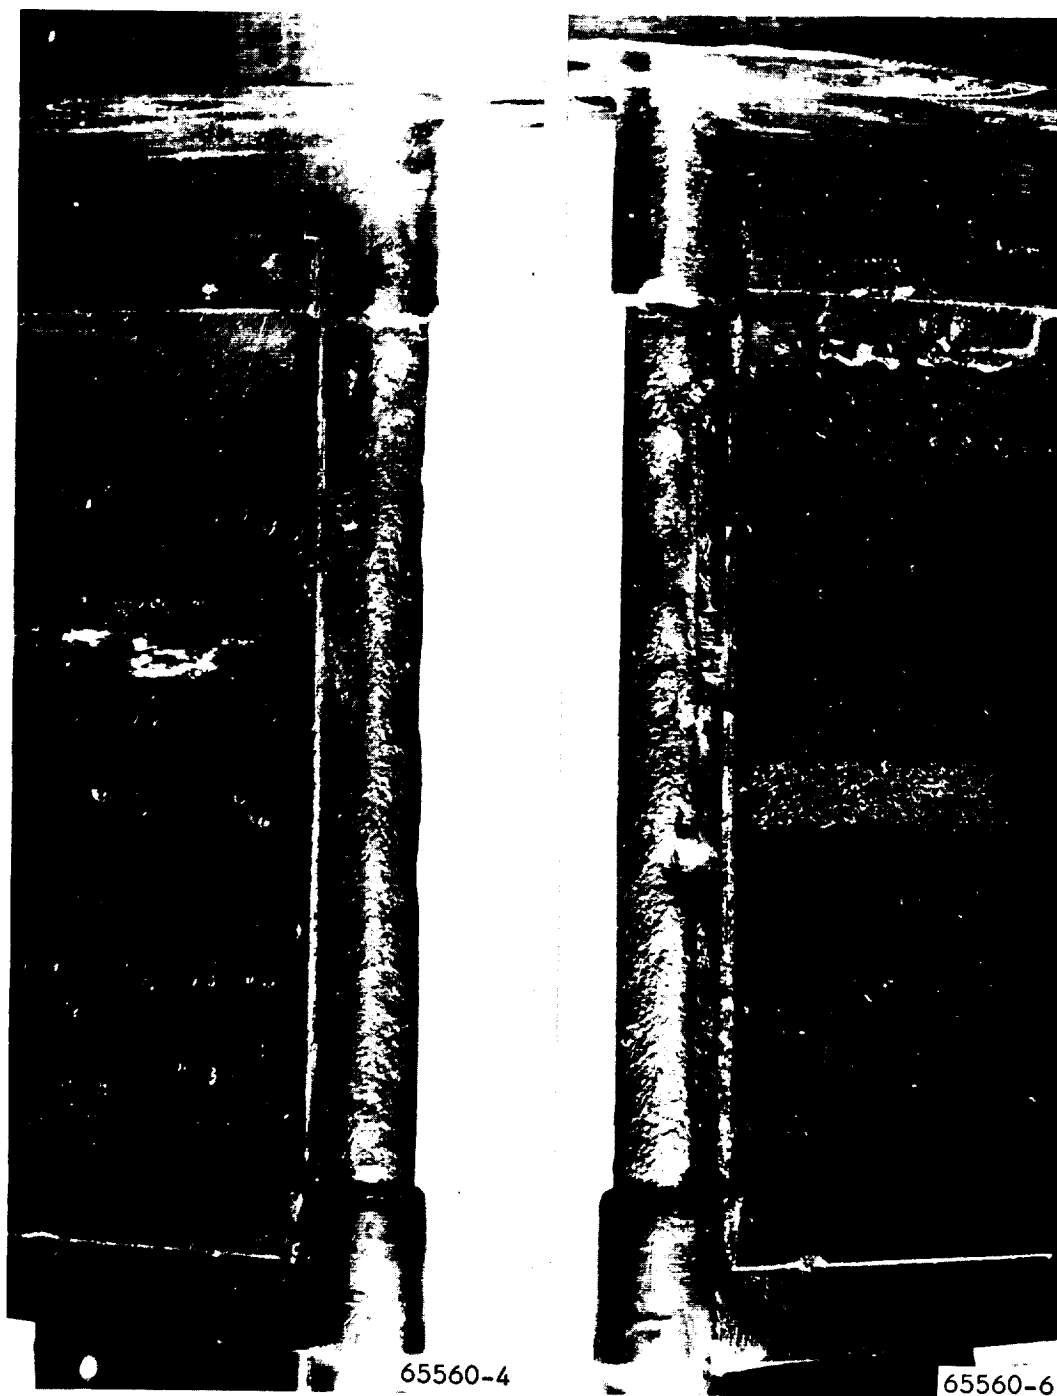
Strut SN 6, Cycles 8 Through 11 Panel Wall and
